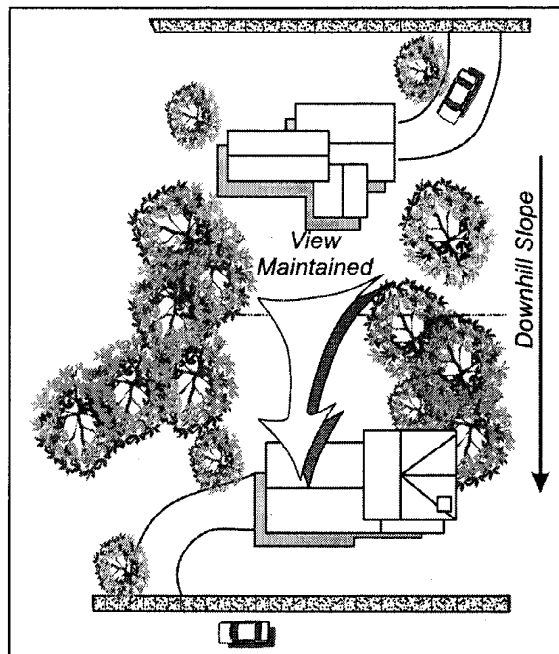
Example of Preferred Location of Second Floor to Preserve Views
